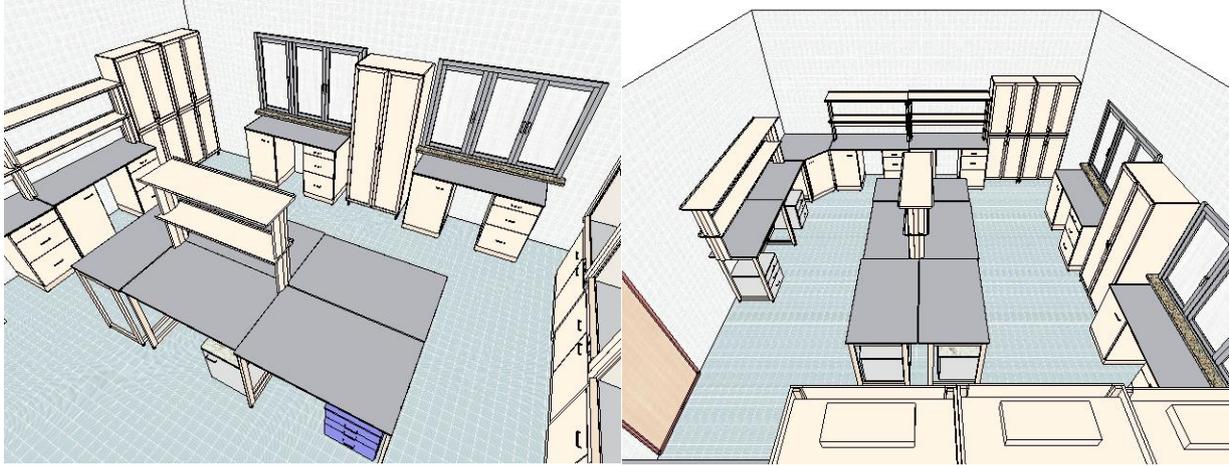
The laboratory design of Drilling Fluid Laboratory:
